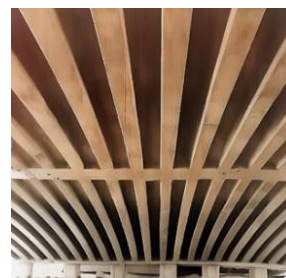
Consolidation of reinforced concrete blocks of UBS 187.14 in the middle of the middle span of the overpass
